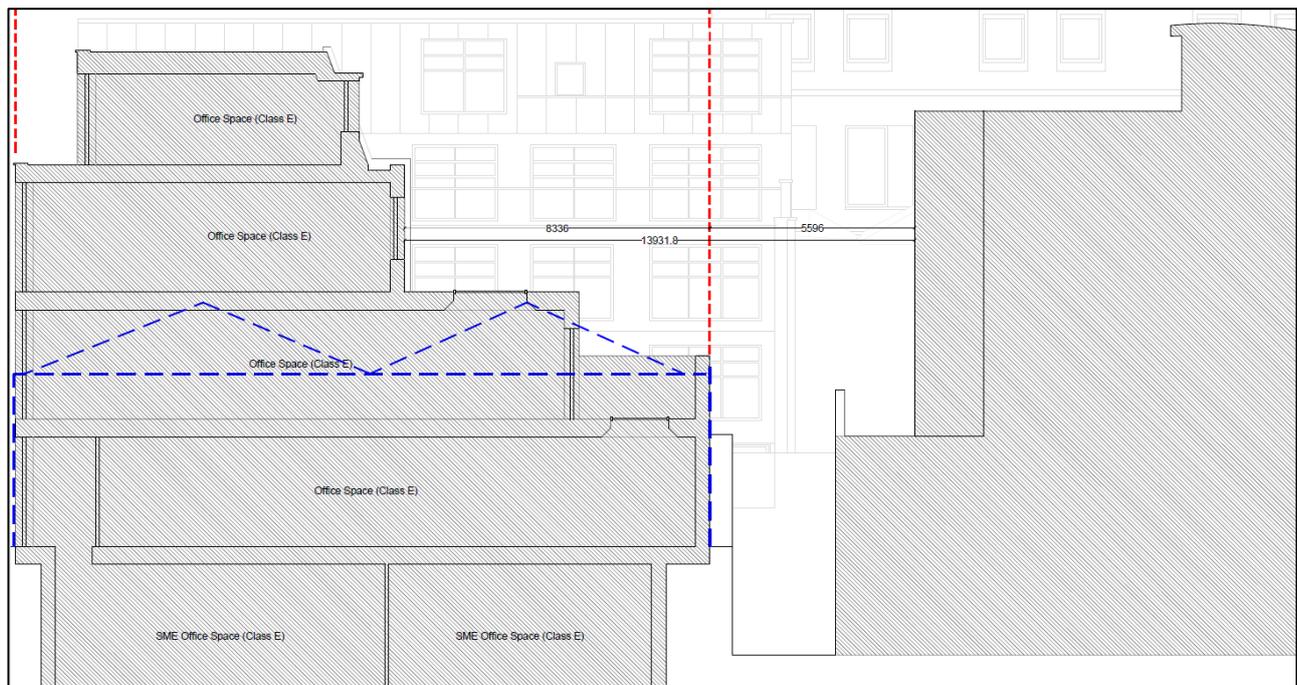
Section showing the separation distance between the rear of the proposed building and neighbouring Pietra Lara building.
